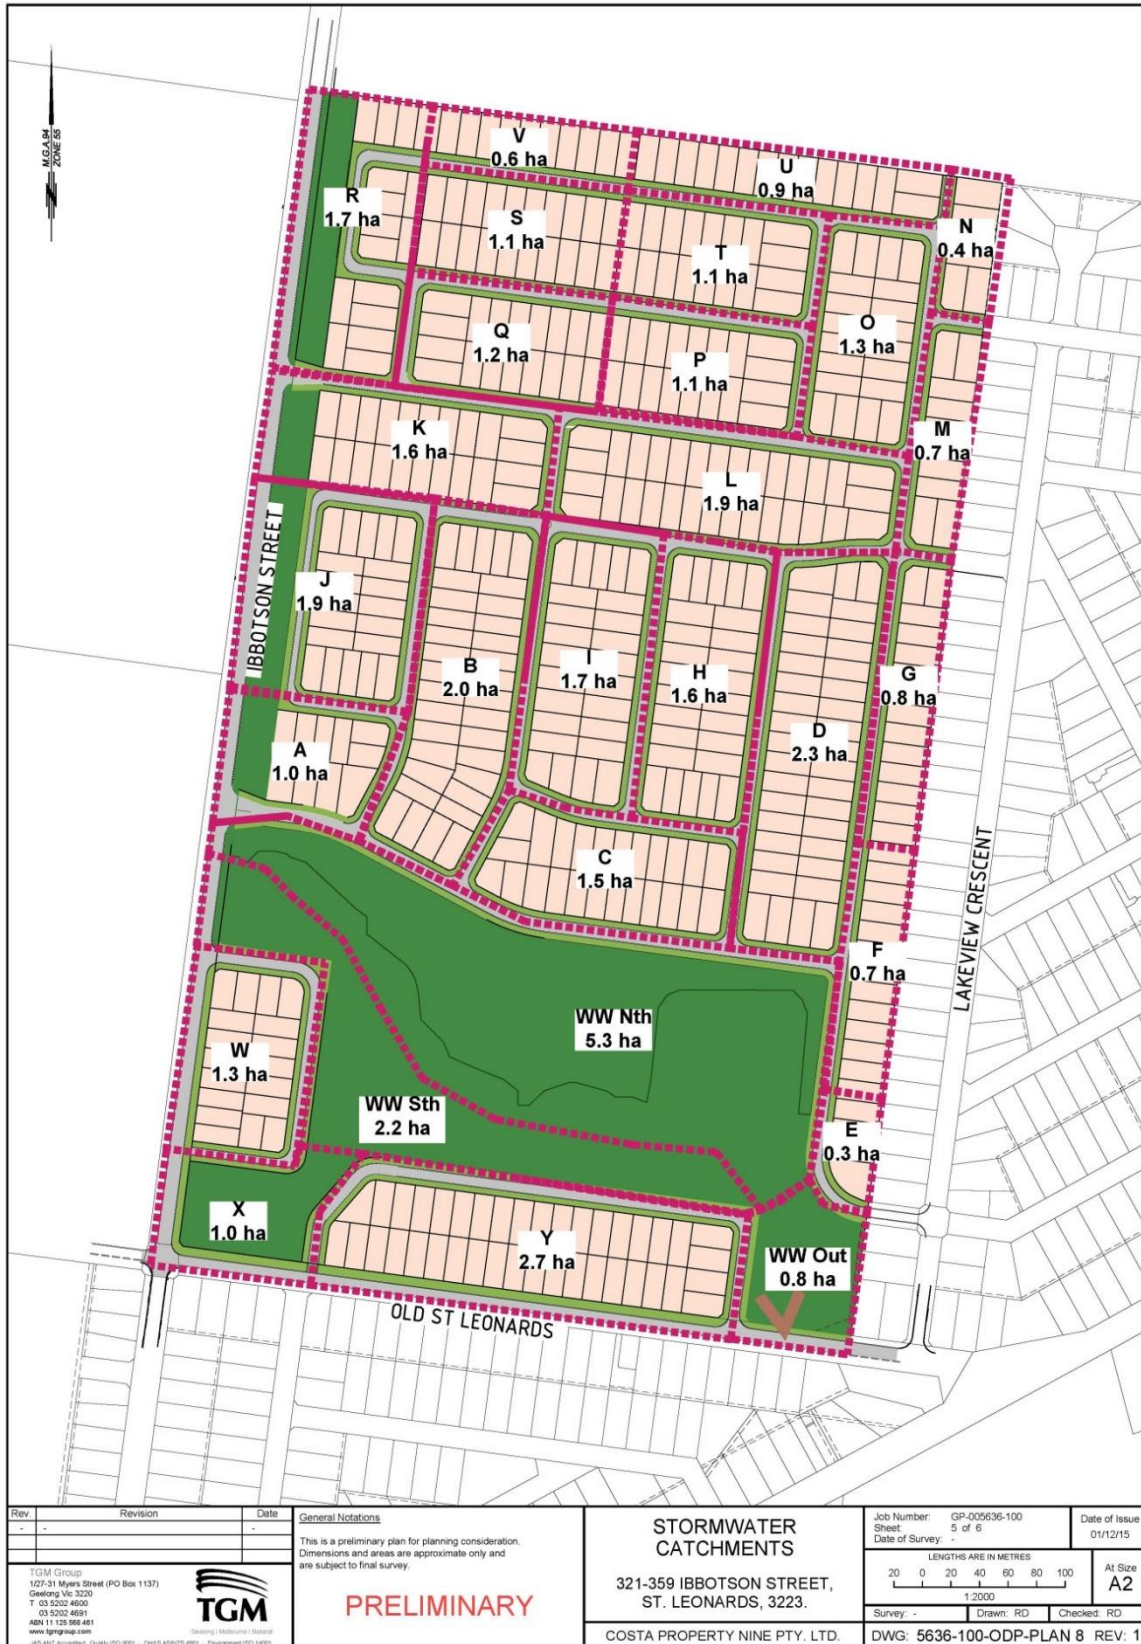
Ibbotson Street proposed development plan and stormwater catchment area
